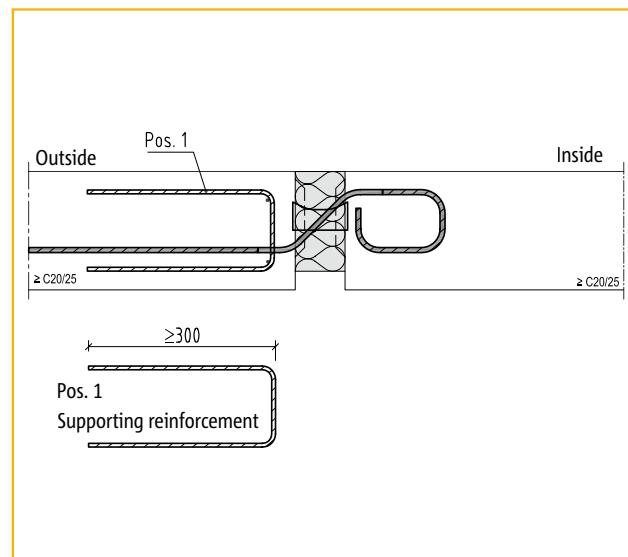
Schöck Isokorb® type Q-HTE additional reinforcement
